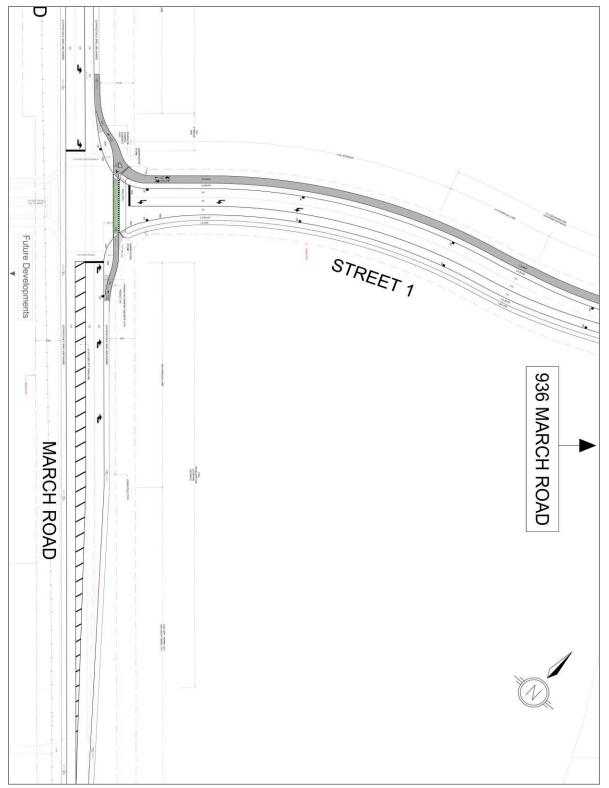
March Road at Street No.2 / Street 1 (north) RMA
